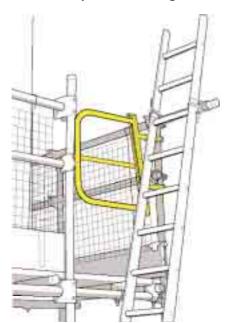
Access ladders should be tied and extend at least 1 m above the landing point to provide a secure handhold
